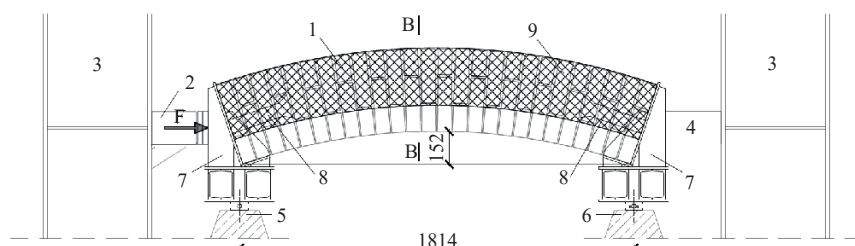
Test setup diagram without reinforcement (TOR): 1 – Test specimen; 2 – Hydraulic actuator; 3 – Steel frame; 4 – Square steel tube; 5 – Hinged-sliding support; 6 – Hinged-fixed support; 7 – Steel fitting; 8 – Support zone reinforcement
